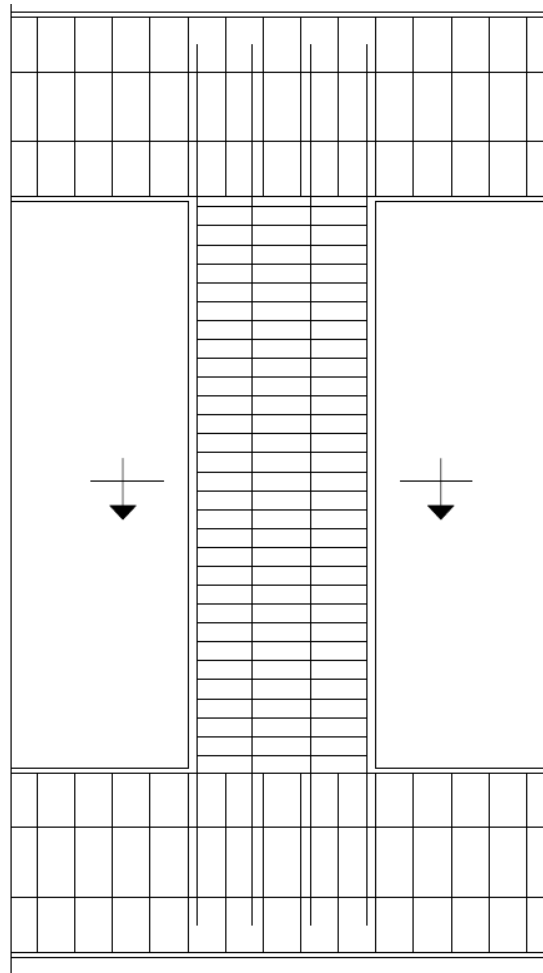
Top and Bottom Blocks cross section reinforcement
